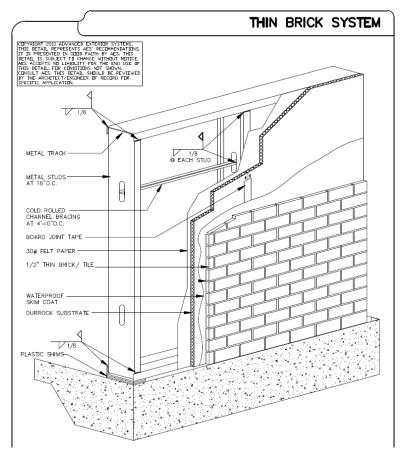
Thin Brick Panel Cut Sheet Courtesy of Advanced Exterior Systems
